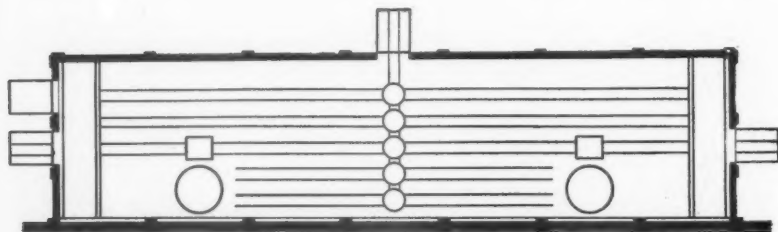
CHARGING FLOOR, AMERICAN CAR & FOUNDRY CO.
